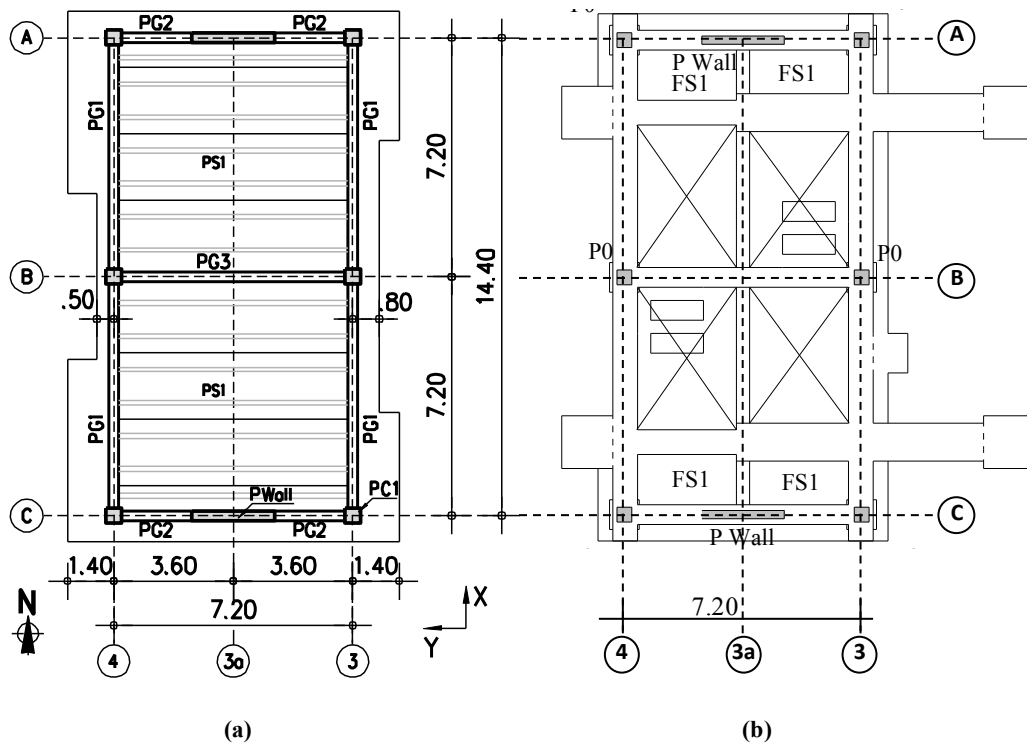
Typical framing plan (a) and foundation plan (b) of PT building (dimensions in m)
